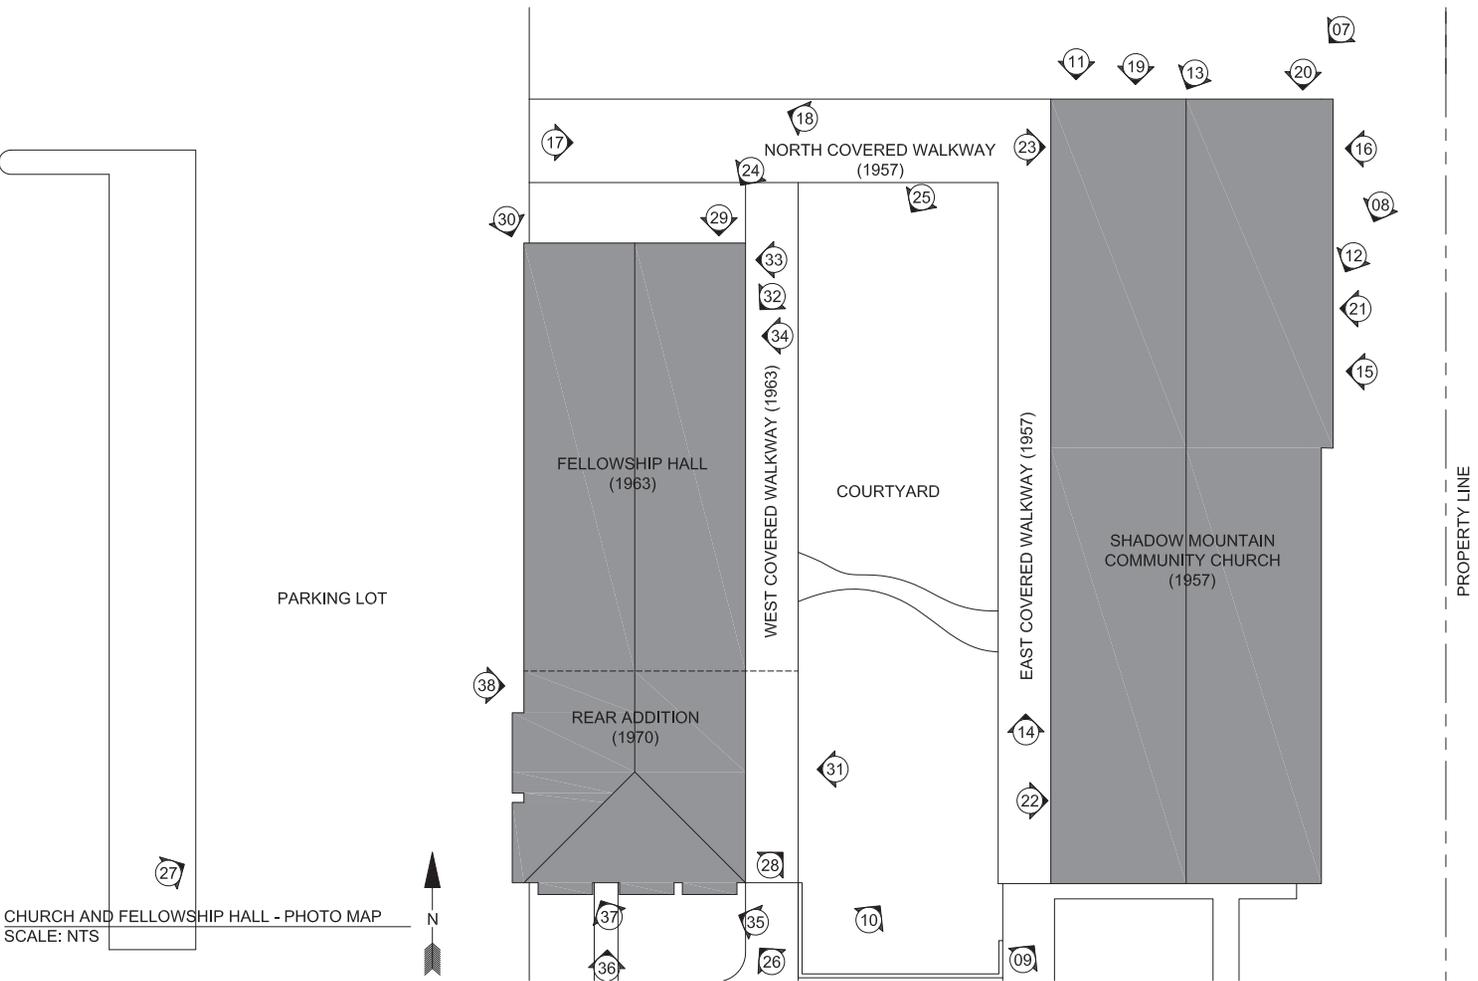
Photo key plan for the main Church building and Fellowship Hall.
